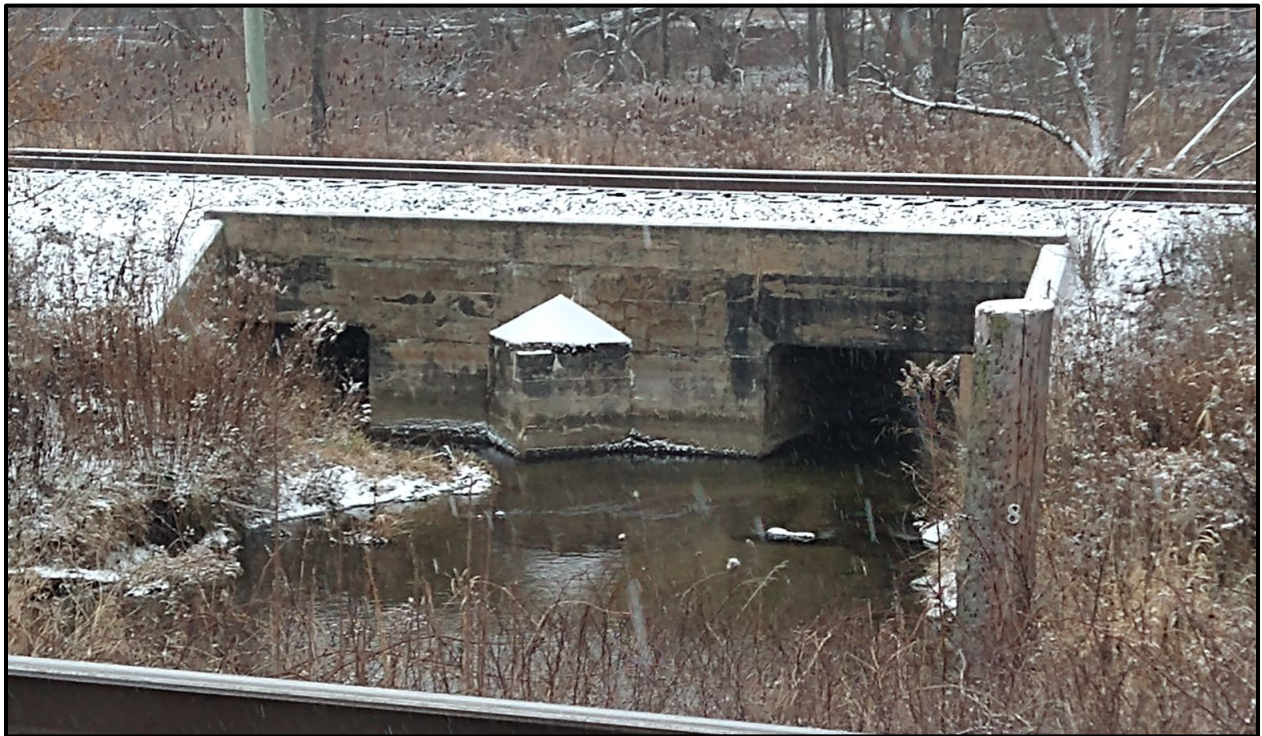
Image of Butler Creek South Railway Dual-Opening Concrete Culvert Crossing
